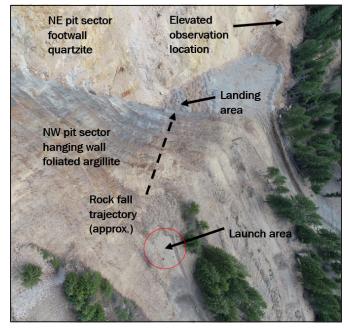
Example of rockfall test safety planning schematic developed after small-scale 6-inch rockfall testing using aerial drone photo.
